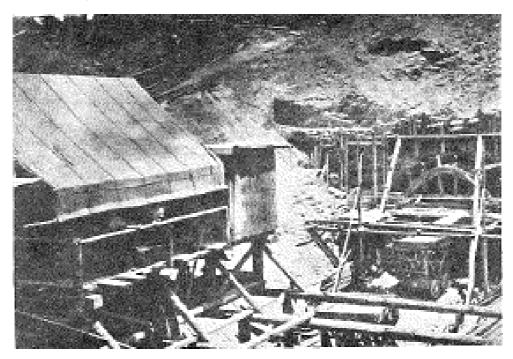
Construction of the railway tunnel at Red Hill (Yeates 1990a, p. 84)
